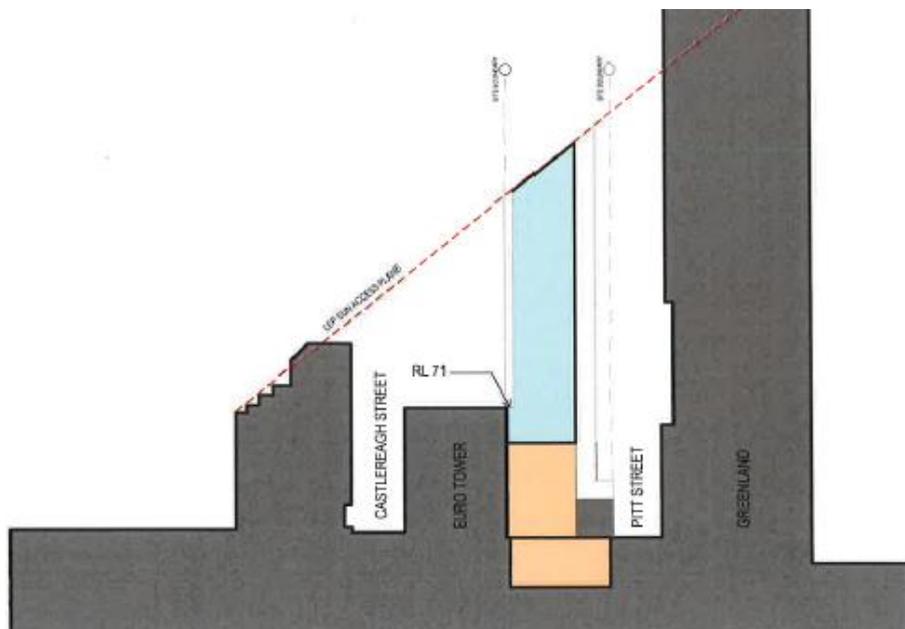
Pitt Street South Concept SSD DA – North South Section
